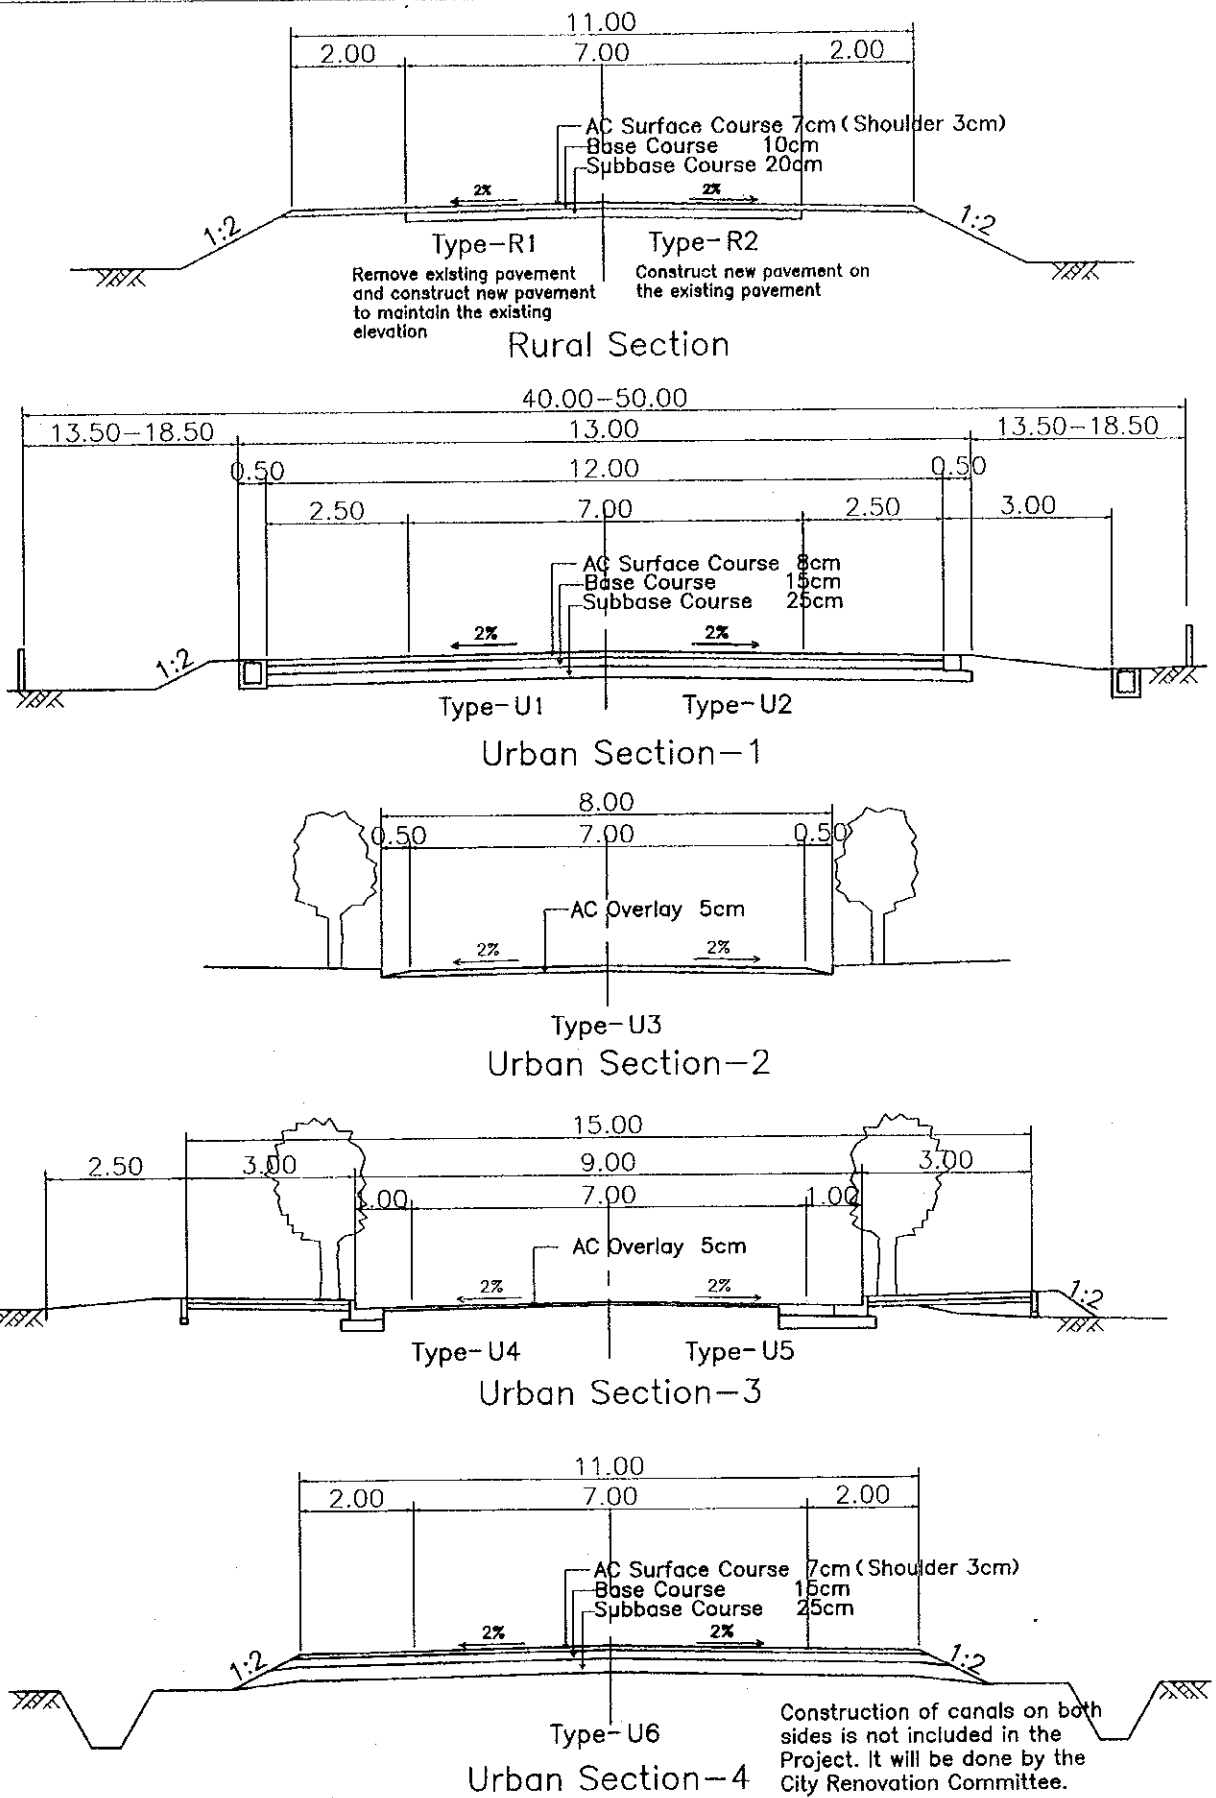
STANDARD CROSS SECTIONS
